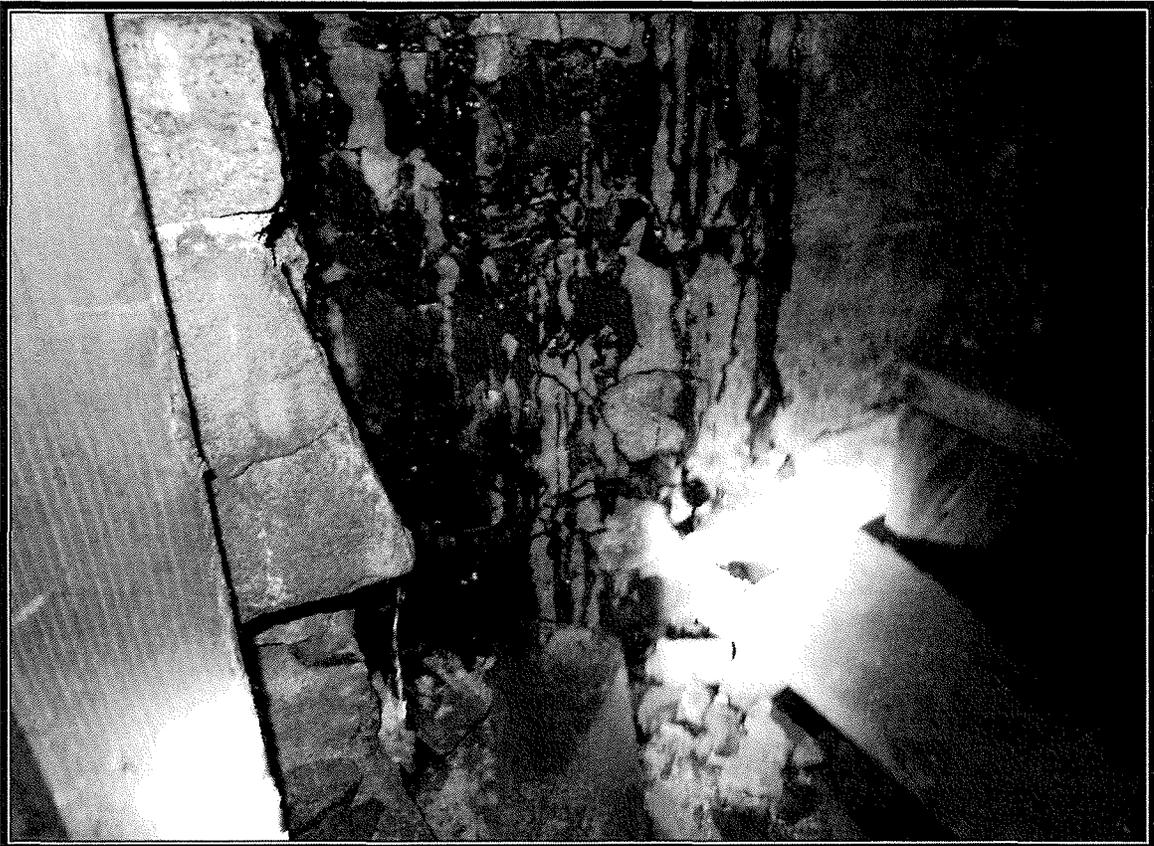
Moisture entering the basement walls damaging and bowing the walls inward and creating unsanitary conditions.
